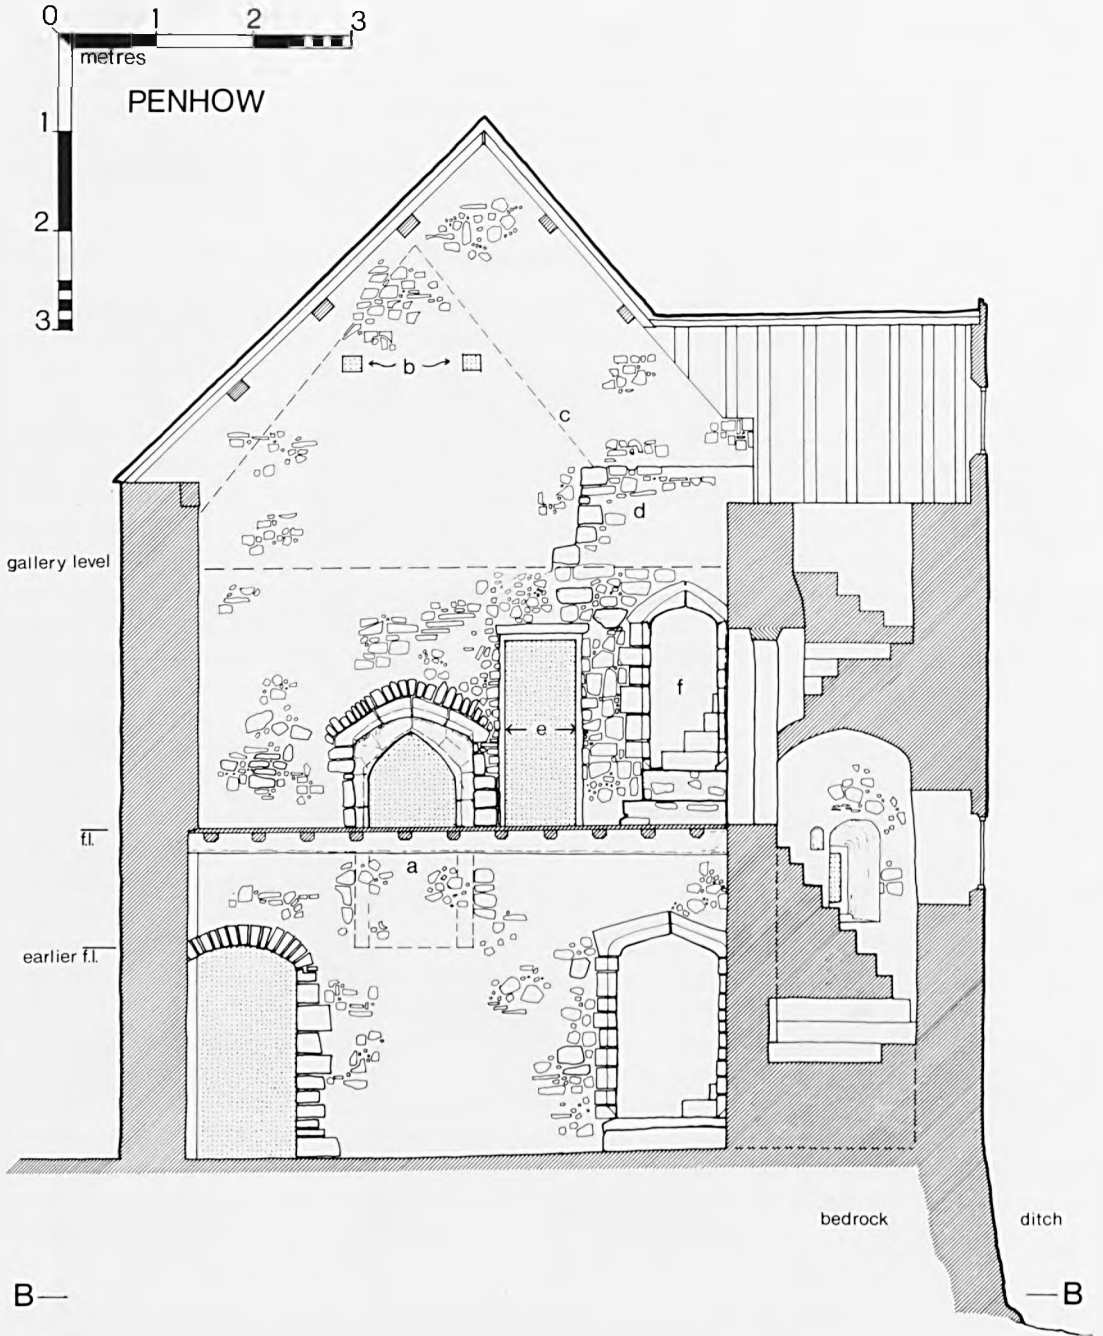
Internal east end elevation of the Hall, and section through the stair tower.
